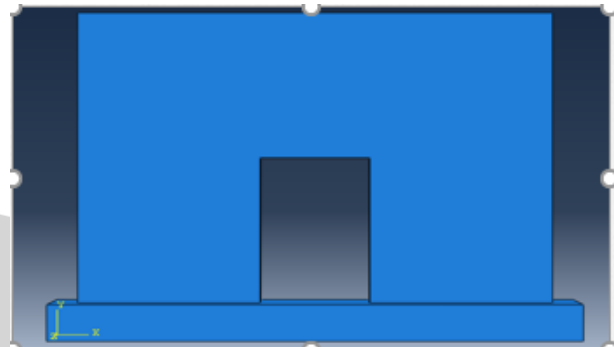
Model 2 Shear wall with size of opening 2 m x 1.2 m
